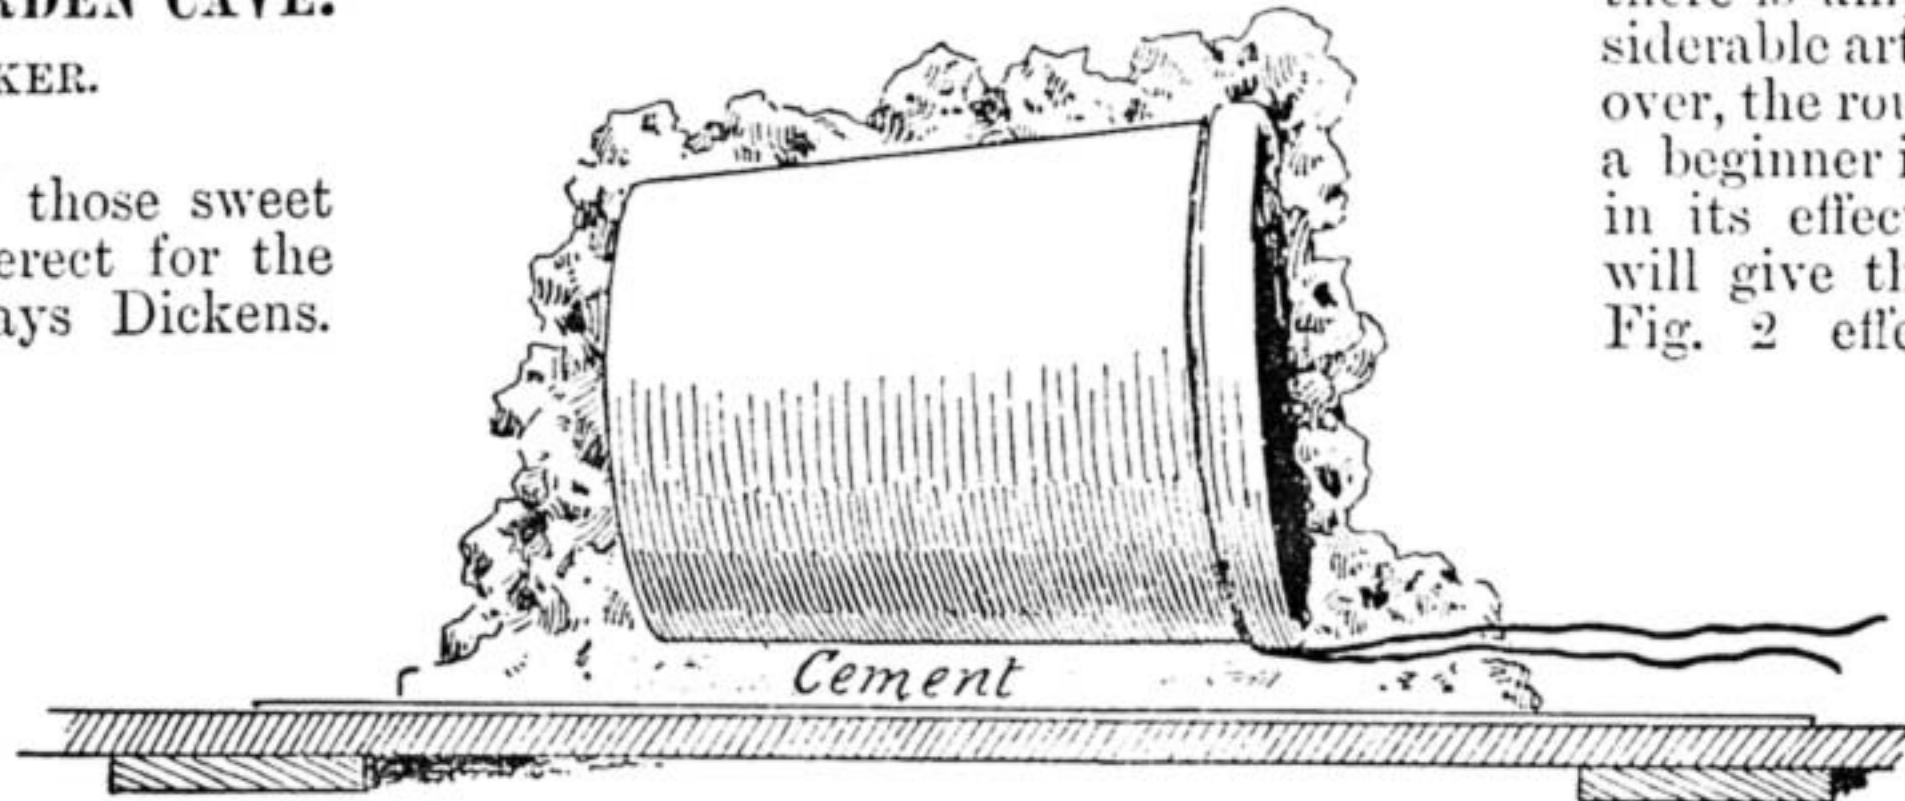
Section, showing Method of Making the Pot Pocket.
